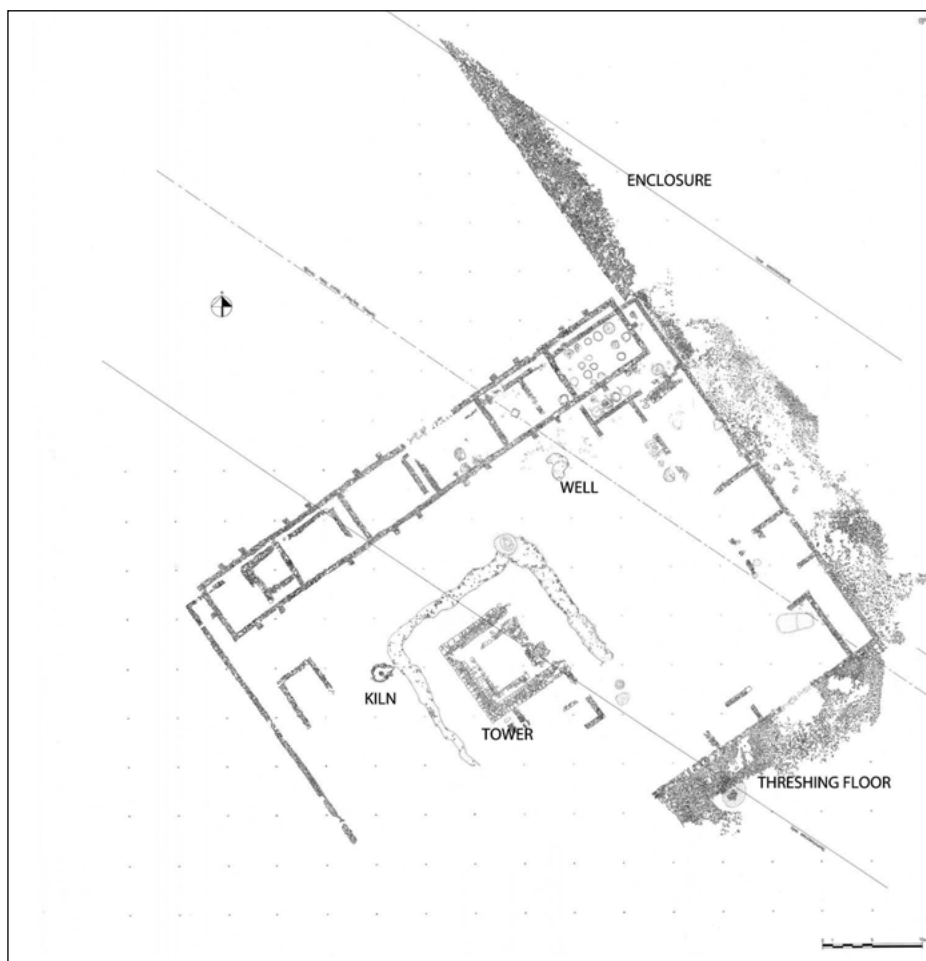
Site plan of Platania (courtesy of E. Poulaki).
